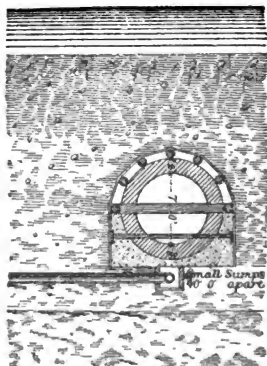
Sewer in tunnel under Grand Surrey Canal.
